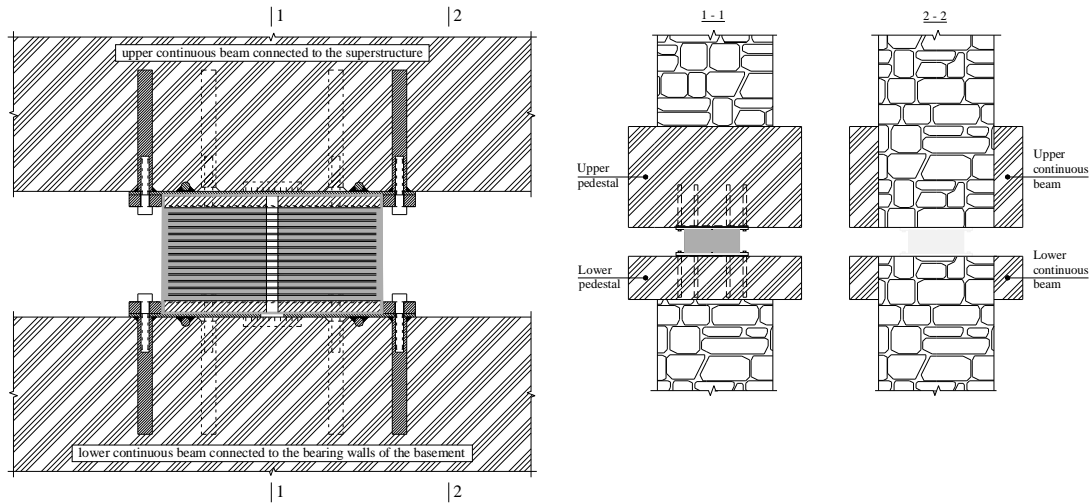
Location of MDRB by upper and lower recesses provided by annular steel rings bolted to the anchors connected to the upper and lower continuous beams in school building
